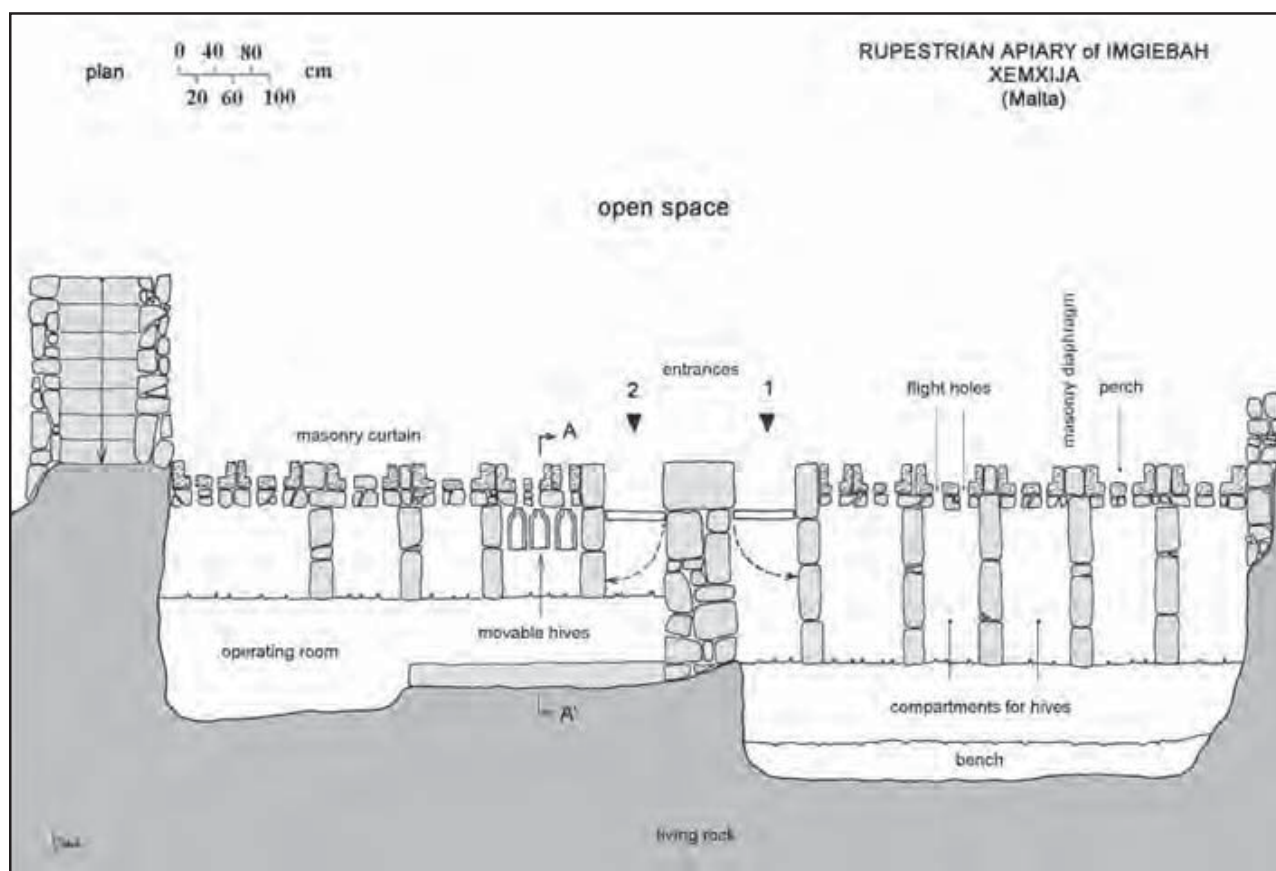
Malta. Apiary of Imgiebah: plan (drawing R. Bixio).
